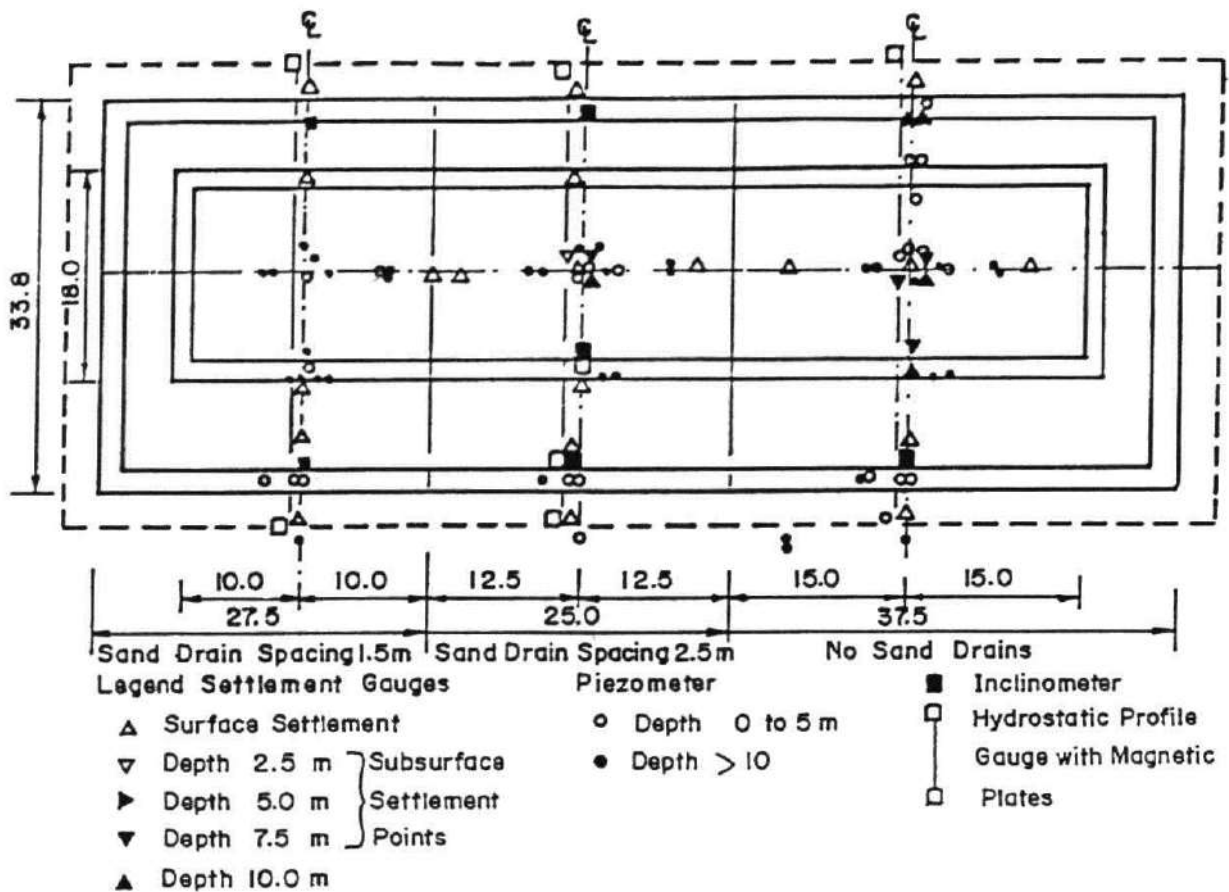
Plan of test embankment at RTN Dockyard site (Balasubramaniam et al. 2005)
